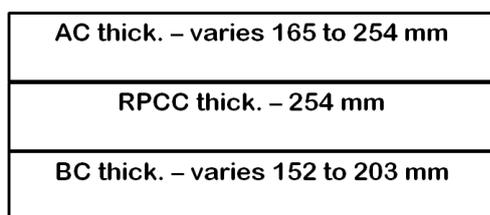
Pavement Layer Thicknesses (AC – Asphaltic Concrete, RPCC – Rubblized Portland Cement Concrete, BC – Soil Cement Base Course).
